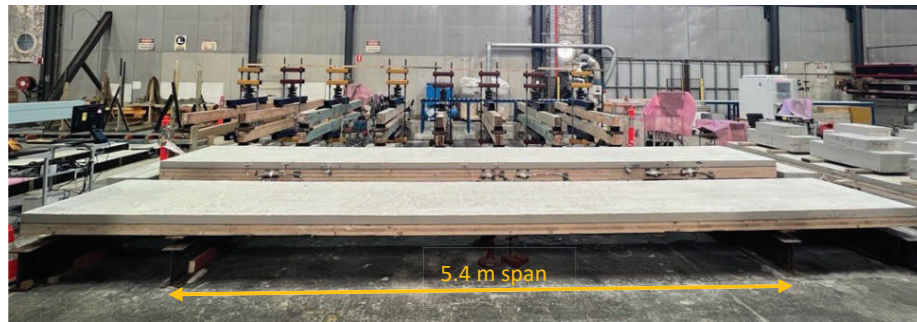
CLT-concrete composite floor specimens with 3-ply and 5-ply CLT panels.
